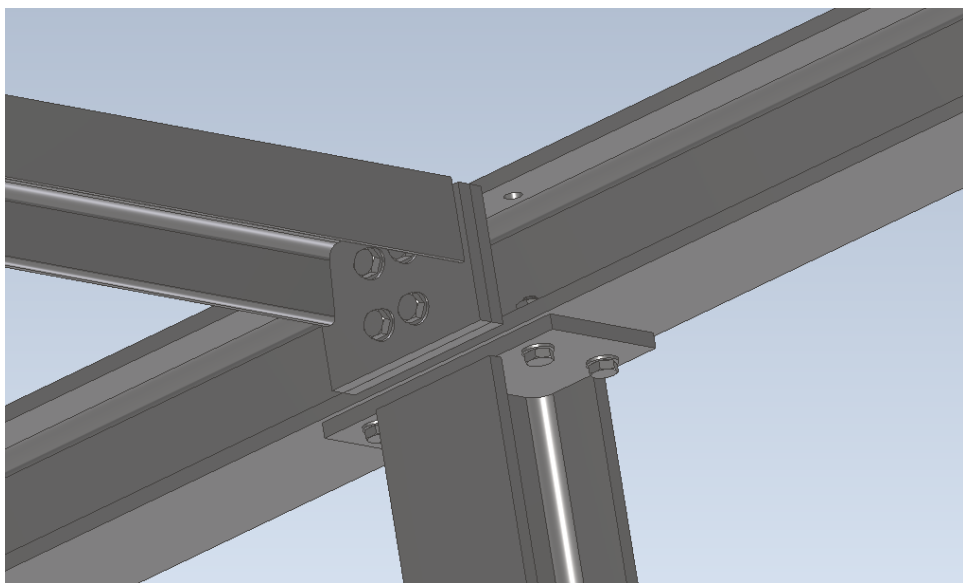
Spacer, transverse beam and longitudinal beam connection.
